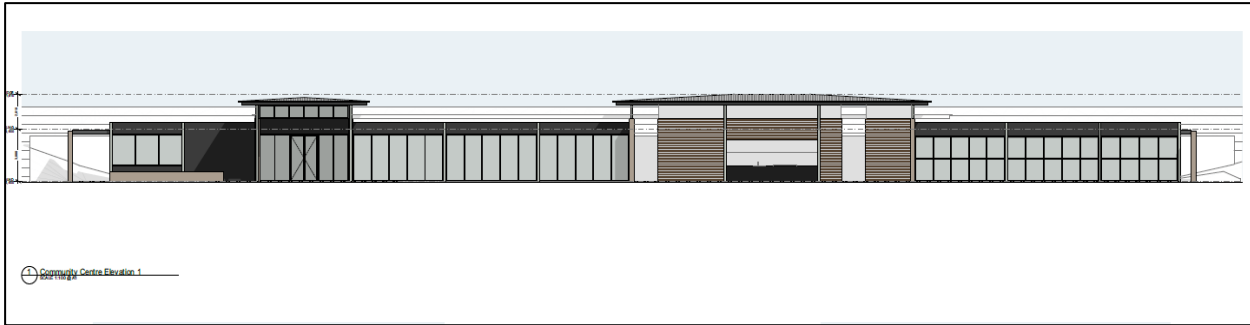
Proposed amended Community Clubhouse design – front northern elevation.
